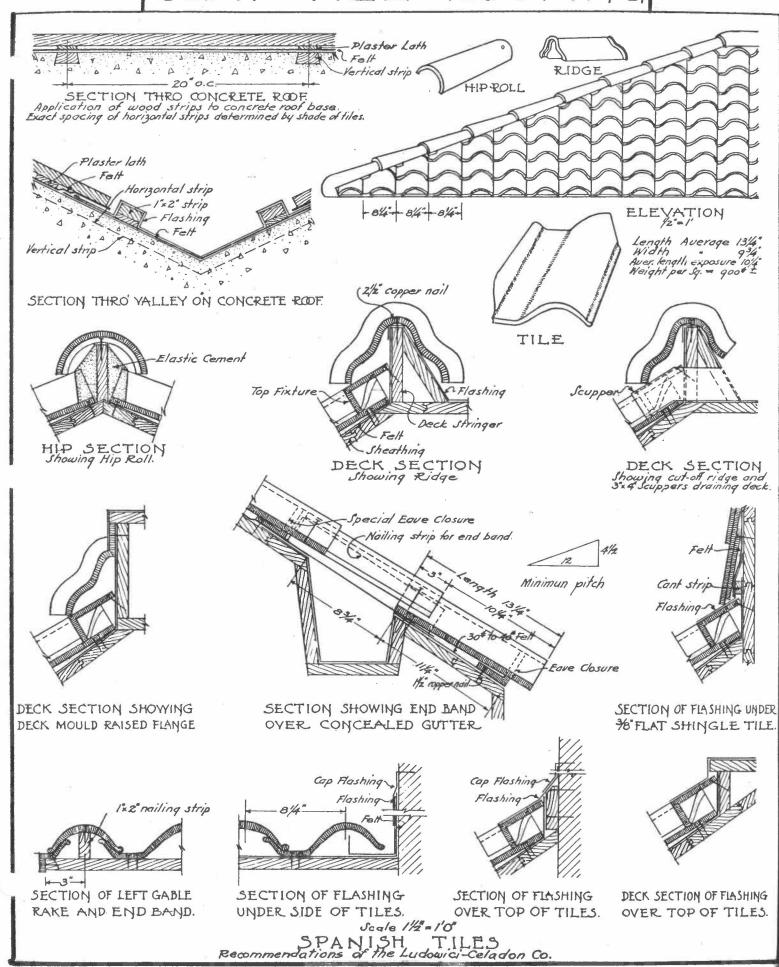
CLAY TILE ROOFING (LEFT)
